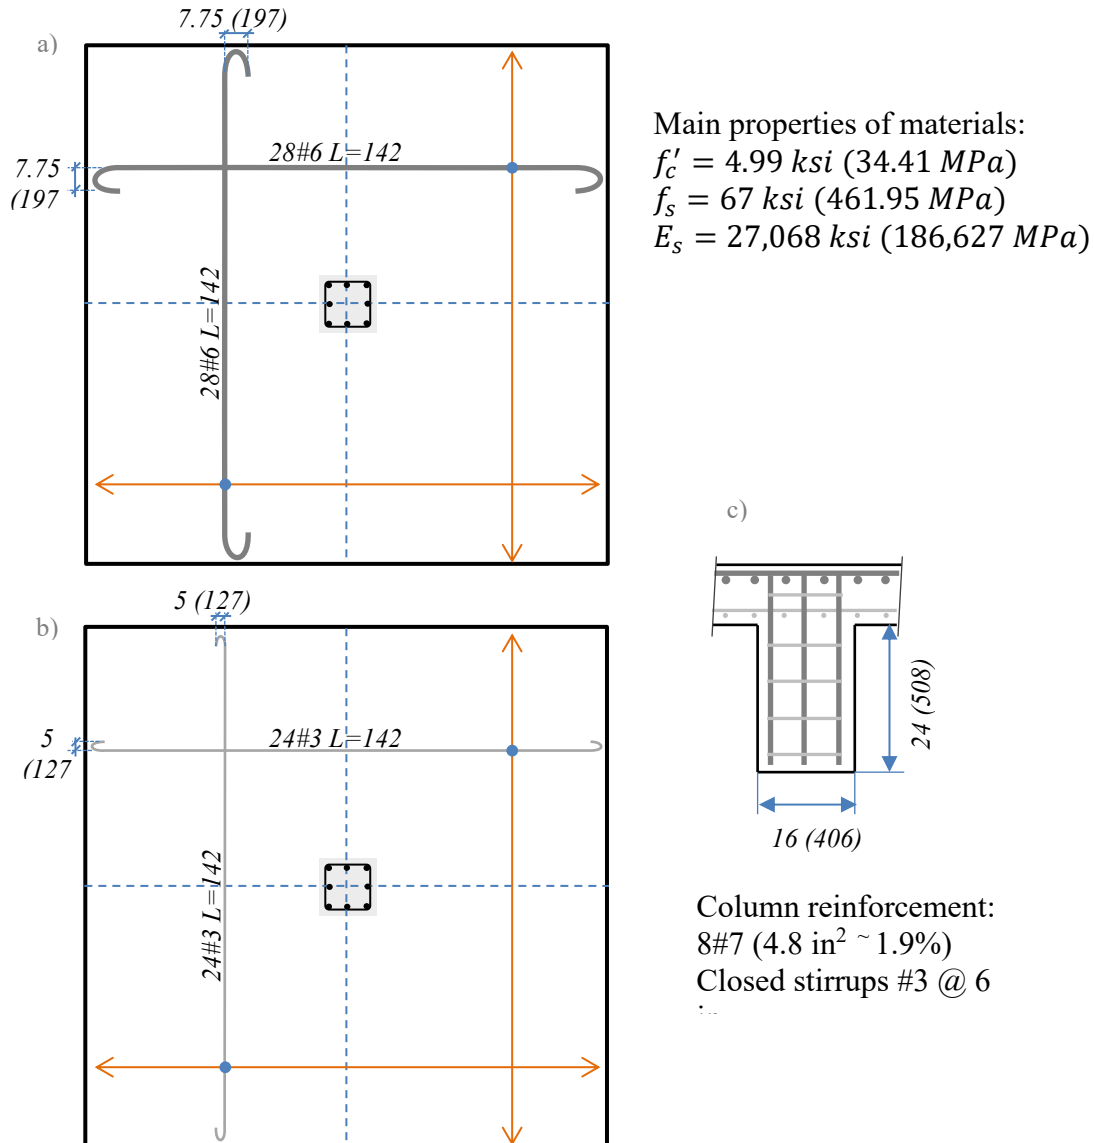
Main characteristics of specimen U-1.0. Detailing of: a) Top reinforcement; b) Bottom reinforcement; c) Column reinforcement.
